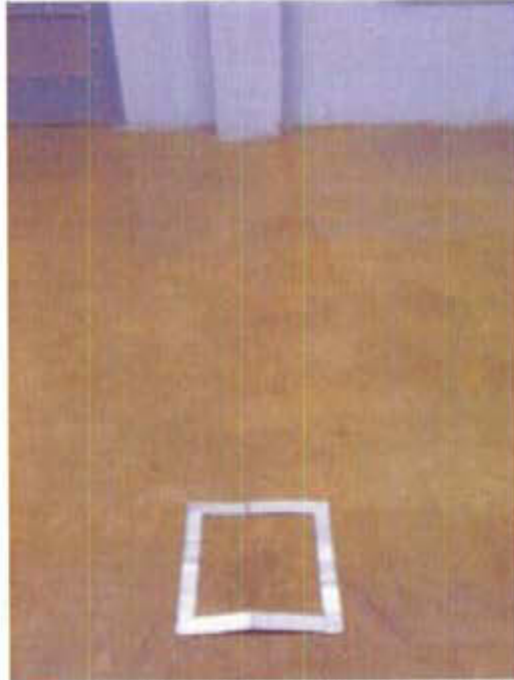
Lead sample 10412-Malta-02 from Drill Floor, southeast corner.
